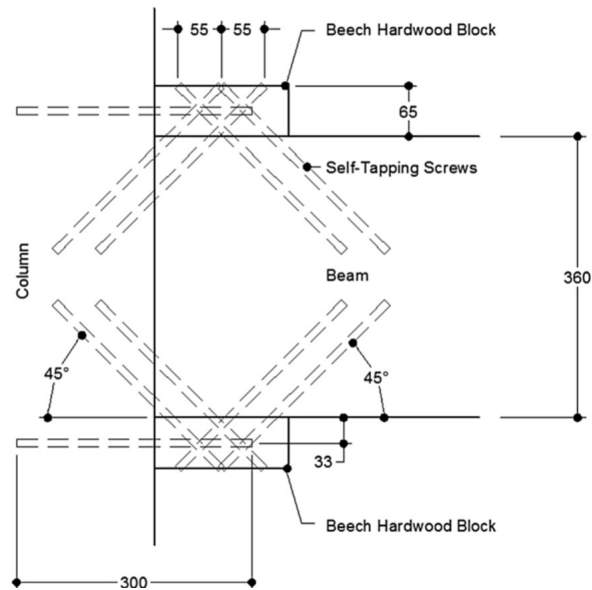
Connection with screws from Kasal et al. (2014) reducing the problem of intersecting fasteners in column.
